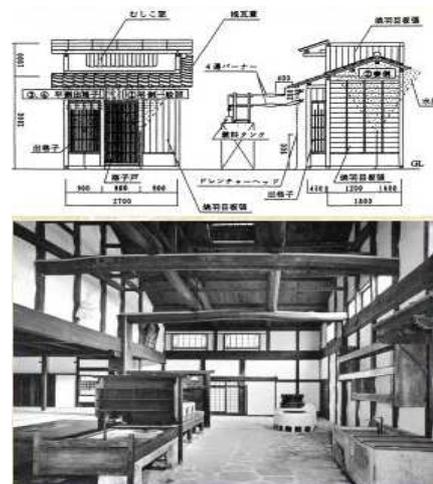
Fire Proof test for traditional wooden House (upper) and Hibukuro design in kitchen (lower)
